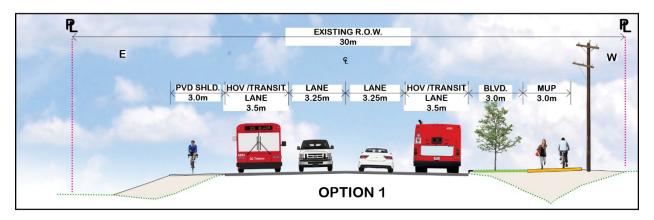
Typical Blair Road Cross-Section (South of OR174)
